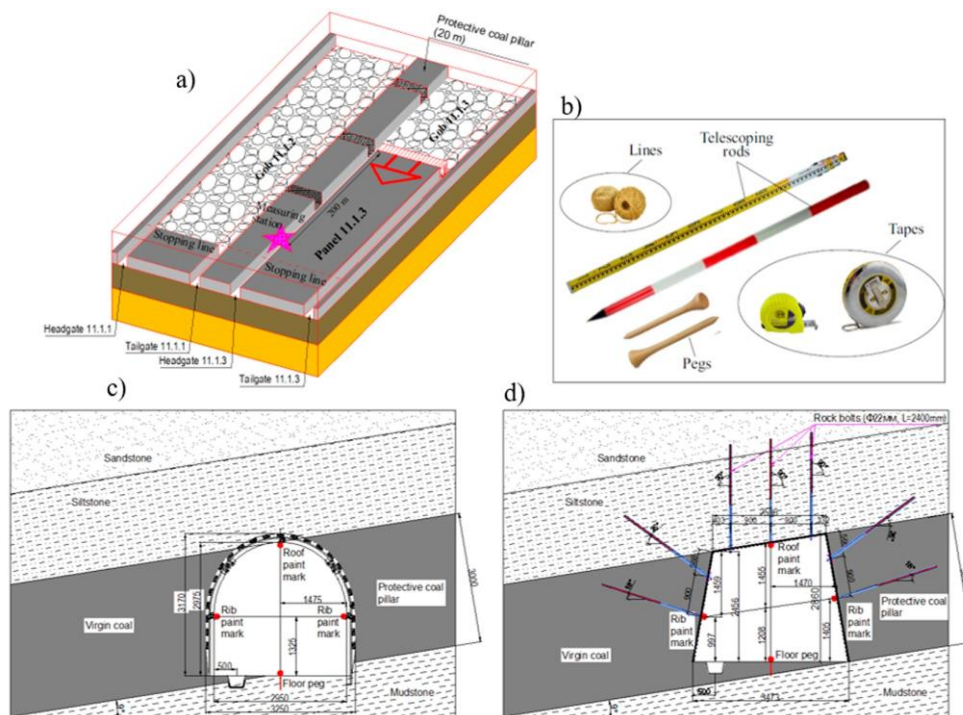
The layout of roadway and roadway convergence measurement in the field.
